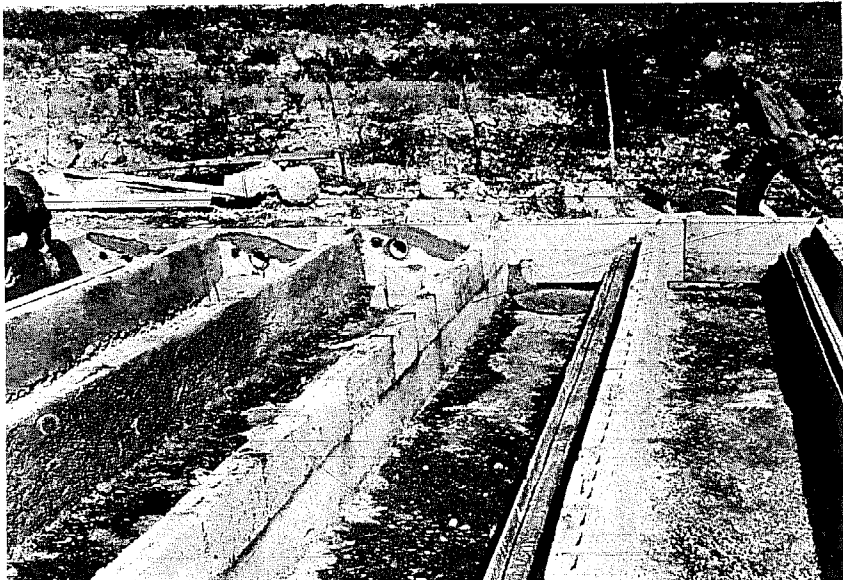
View showing curb walls in various stages of completion - bare concrete and blocks - rough plaster - and fine finish. Also shown is the end wall casting.
